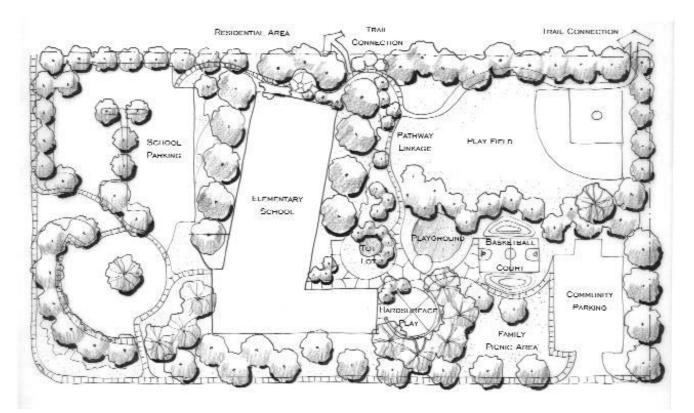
Elementary School/ Neighborhood Park combined facility concept plan.
